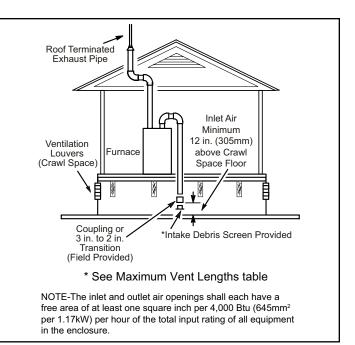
Equipment in Confined Space (Inlet Air from Ventilated Crawlspace and Outlet Air to Outside)
